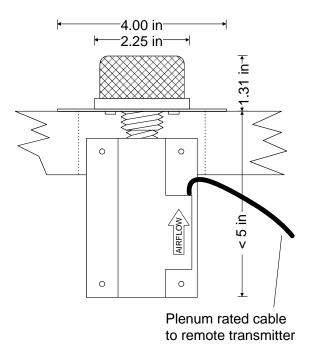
Typical Application, Bleed Airflow Sensor and Underfloor/Floor Mount Installation Kit
